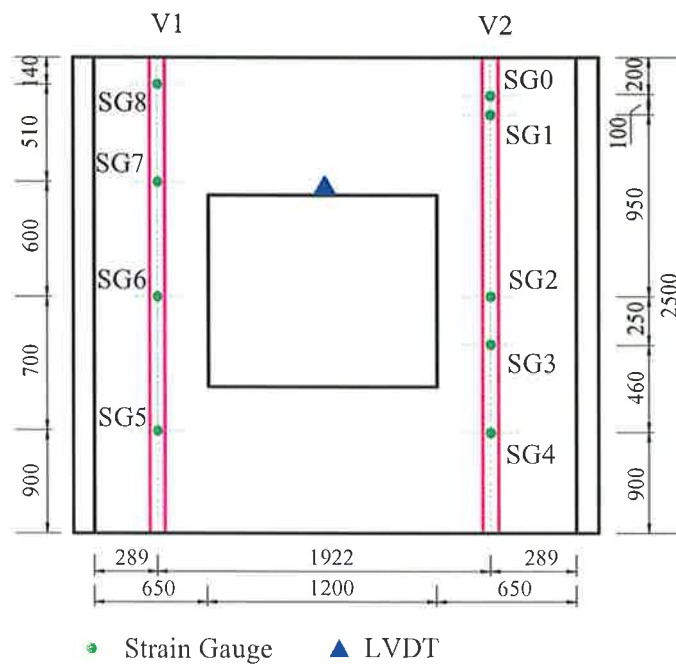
(a) Test scheme and instrumentation layout of Wall 4
